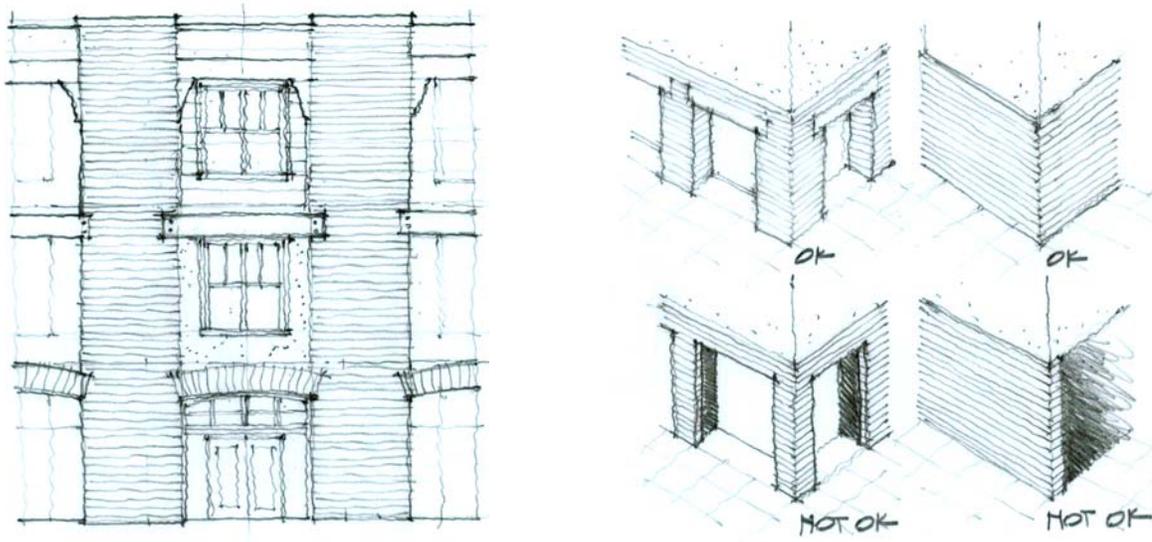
Buildings shall be visually and structurally anchored with masonry elements at the base level to provide a sense of permanence (left). Base level masonry elements shall be functional parts of the vertical load-bearing structure of the building (or appear to be so), not “tacked on” (right).
